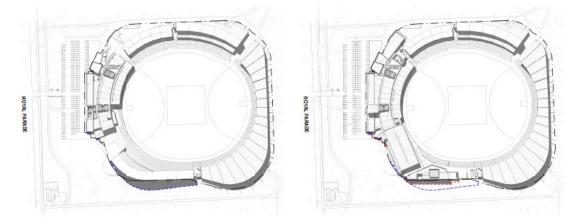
Existing and proposed shadows at 1.00pm at equinox (source: application plans prepared by Populous)
